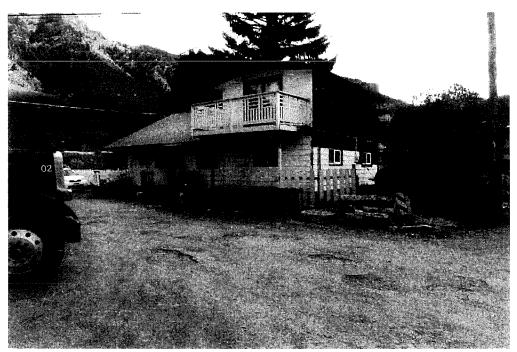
View to East of Residence, and Entrance Driveway – Gravel Surfaced Road
